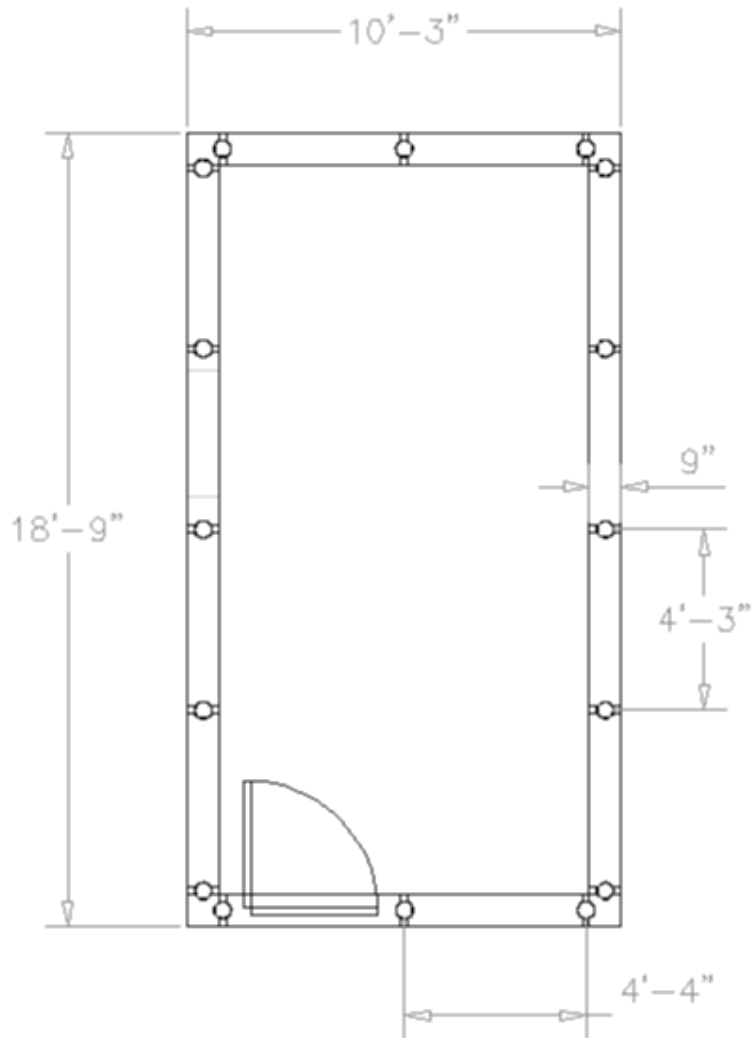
Kitchen Layout Dimensions in Guanteque
